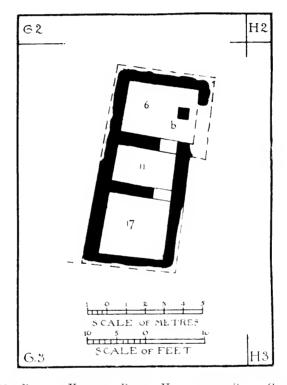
Plan of House of Period II, with the Stone Column b,
